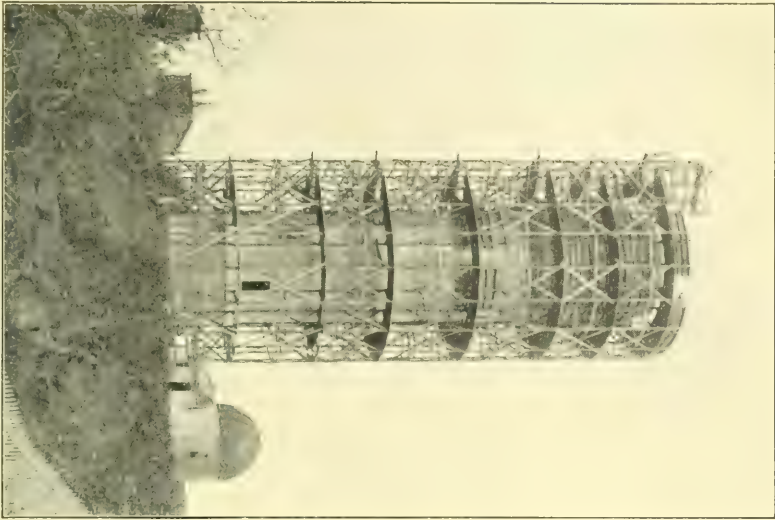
SCAFFOLDING FOR WATER TOWER.
